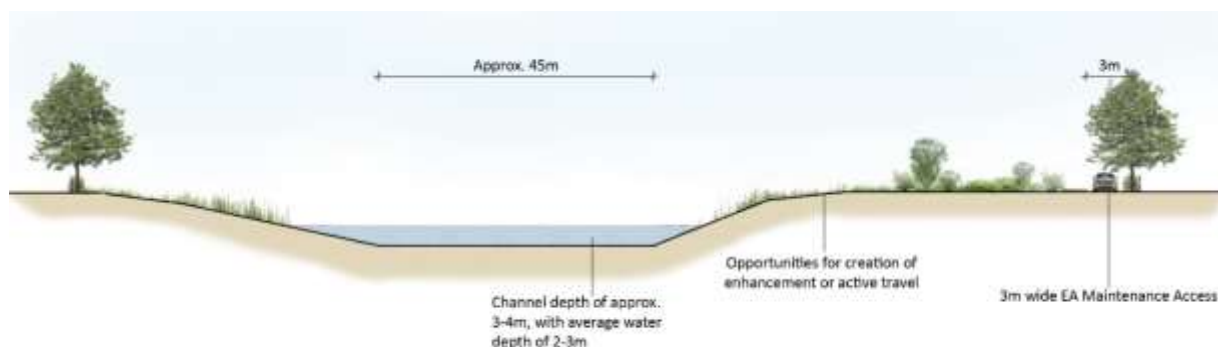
Cross-section example of a typical section of the 'natural' looking trapezoidal channel showing softer slopes with river edge habitat.
